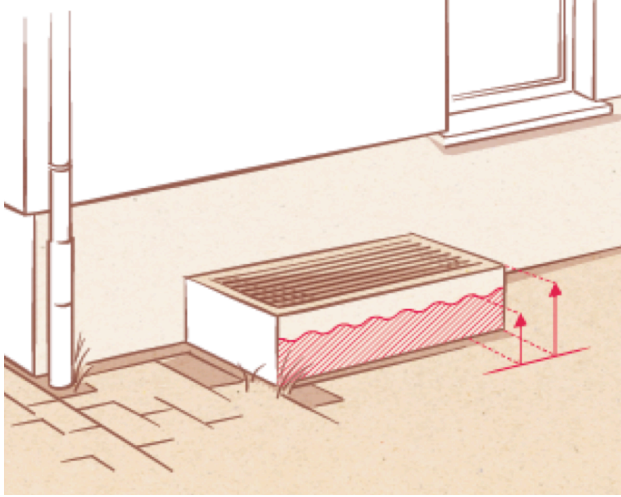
Elevated light wells can prevent the entrance of water into a building. Source: PLANAT
